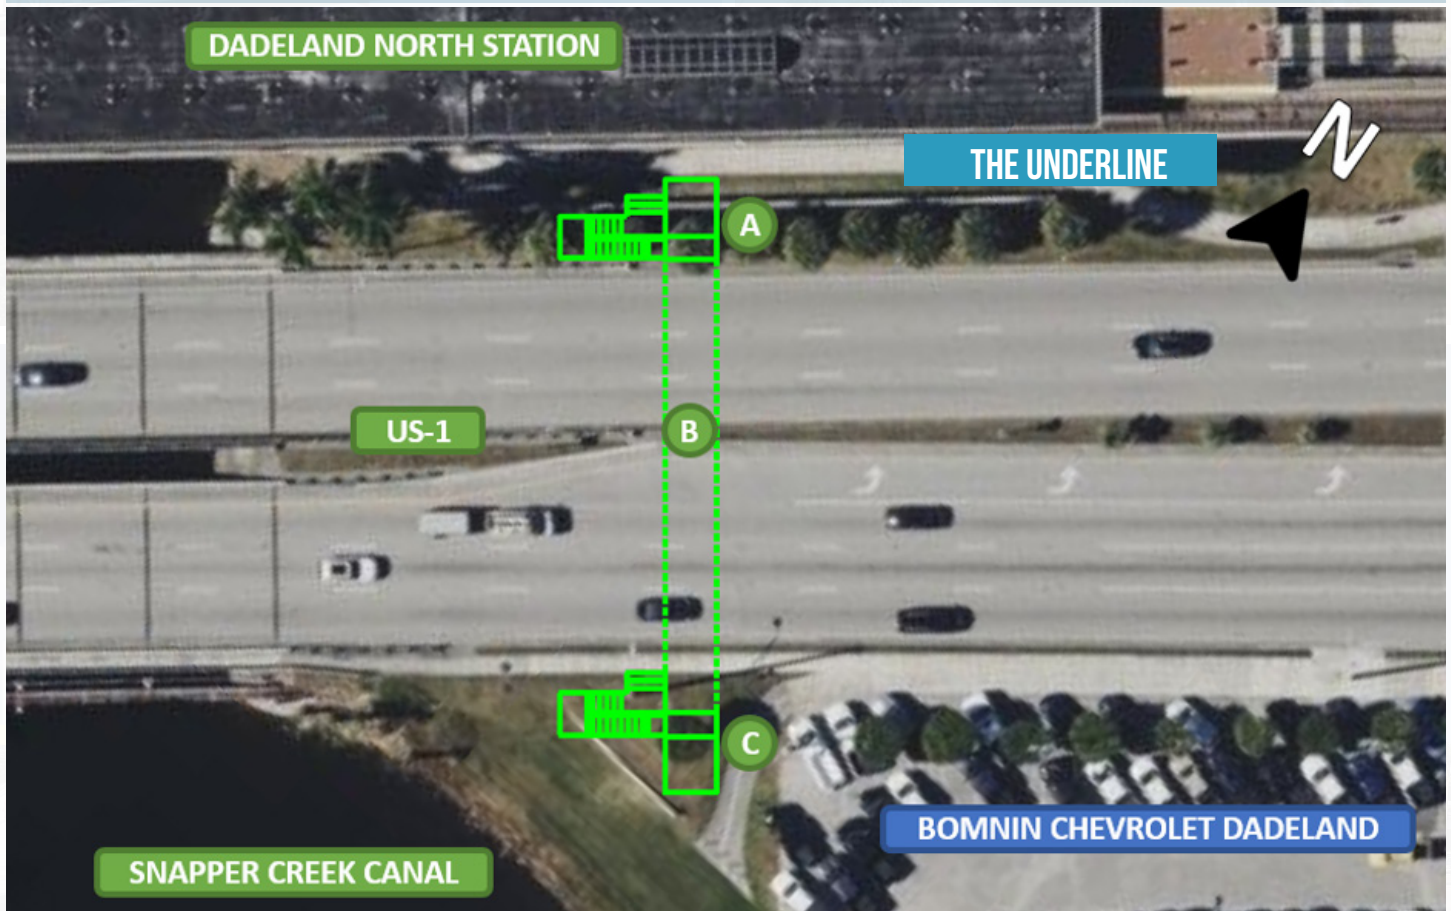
Dadeland North Metrorail Station Alternative 1 Bridge Location
